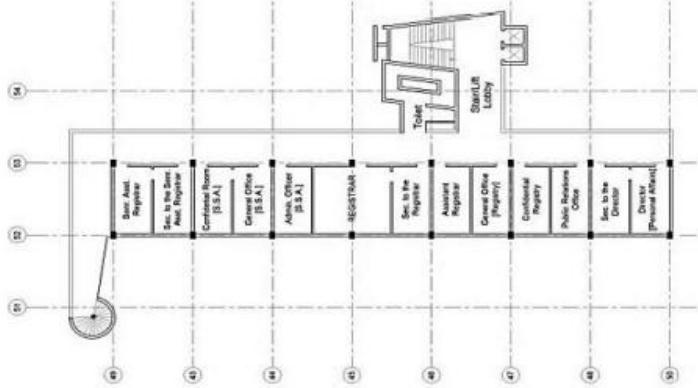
Third floor plan of OAU Senate Building (Source Author's Field work)
